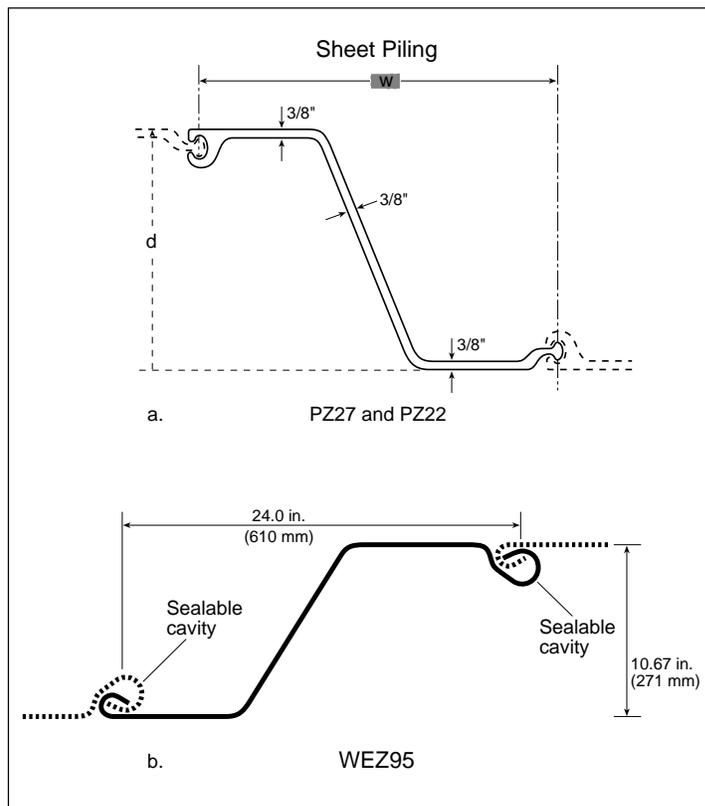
Hot-rolled and cold-rolled pile sections. (a) Bethlehem Steel hot-rolled sheet pile, (b) Canadian Metal Rolling Mills cold-rolled sheet pile
